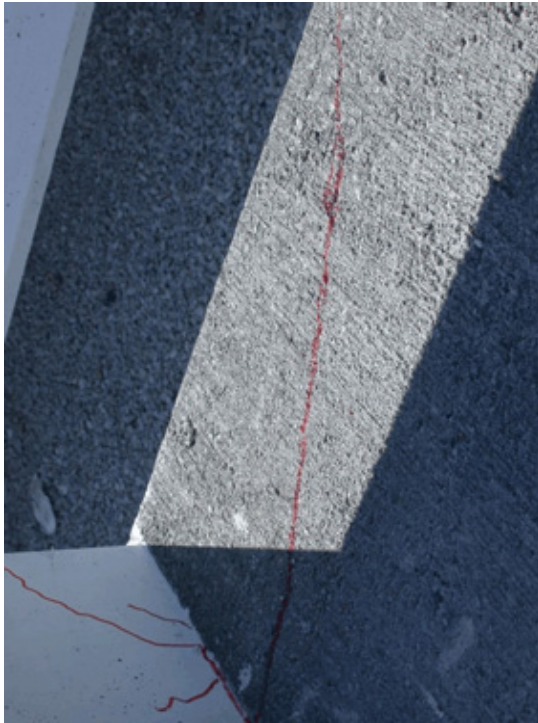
Bridge Deck Damage Around Post No. 5, Test NIT-1
